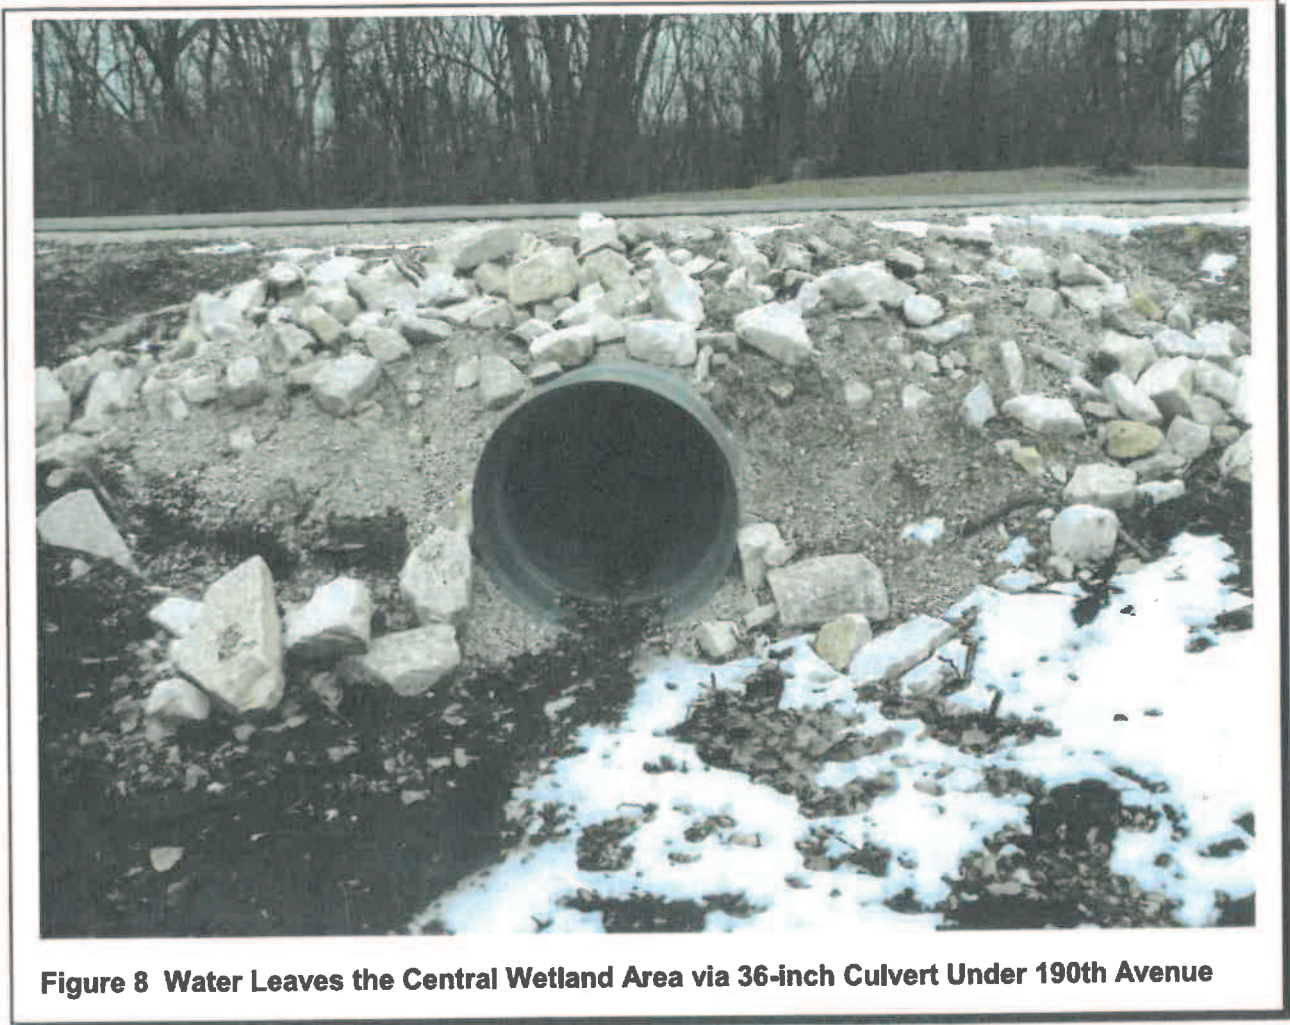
Water Leaves the Central Wetland Area via 36-inch Culvert Under 190th Avenue
